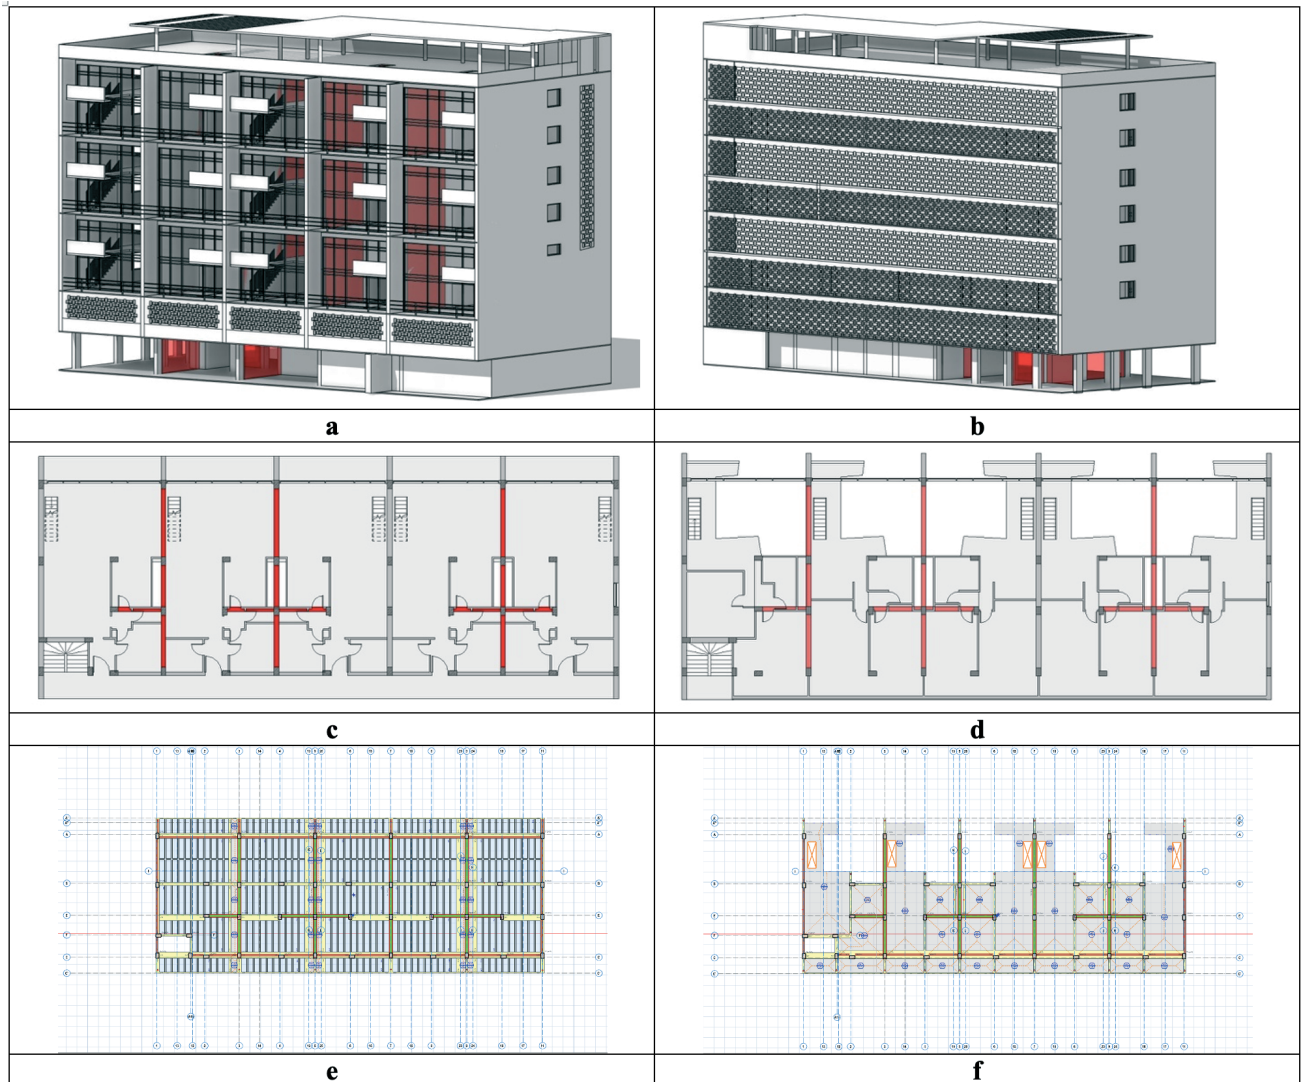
Model 4 – Shear walls along X and Y directions: a. Perspective views from northwest façade. b. Perspective views from southeast façade. c. Residential unit’s entrance floor plan. d. Residential unit’s mezzanine floor plan. e. Residential unit’s entrance floor ProtaStructure model. f. Residential unit’s mezzanine floor ProtaStructure model (3-D images are produced by authors via Autodesk Revit Software; 2-D images are produced via ProtaStructure Software).
